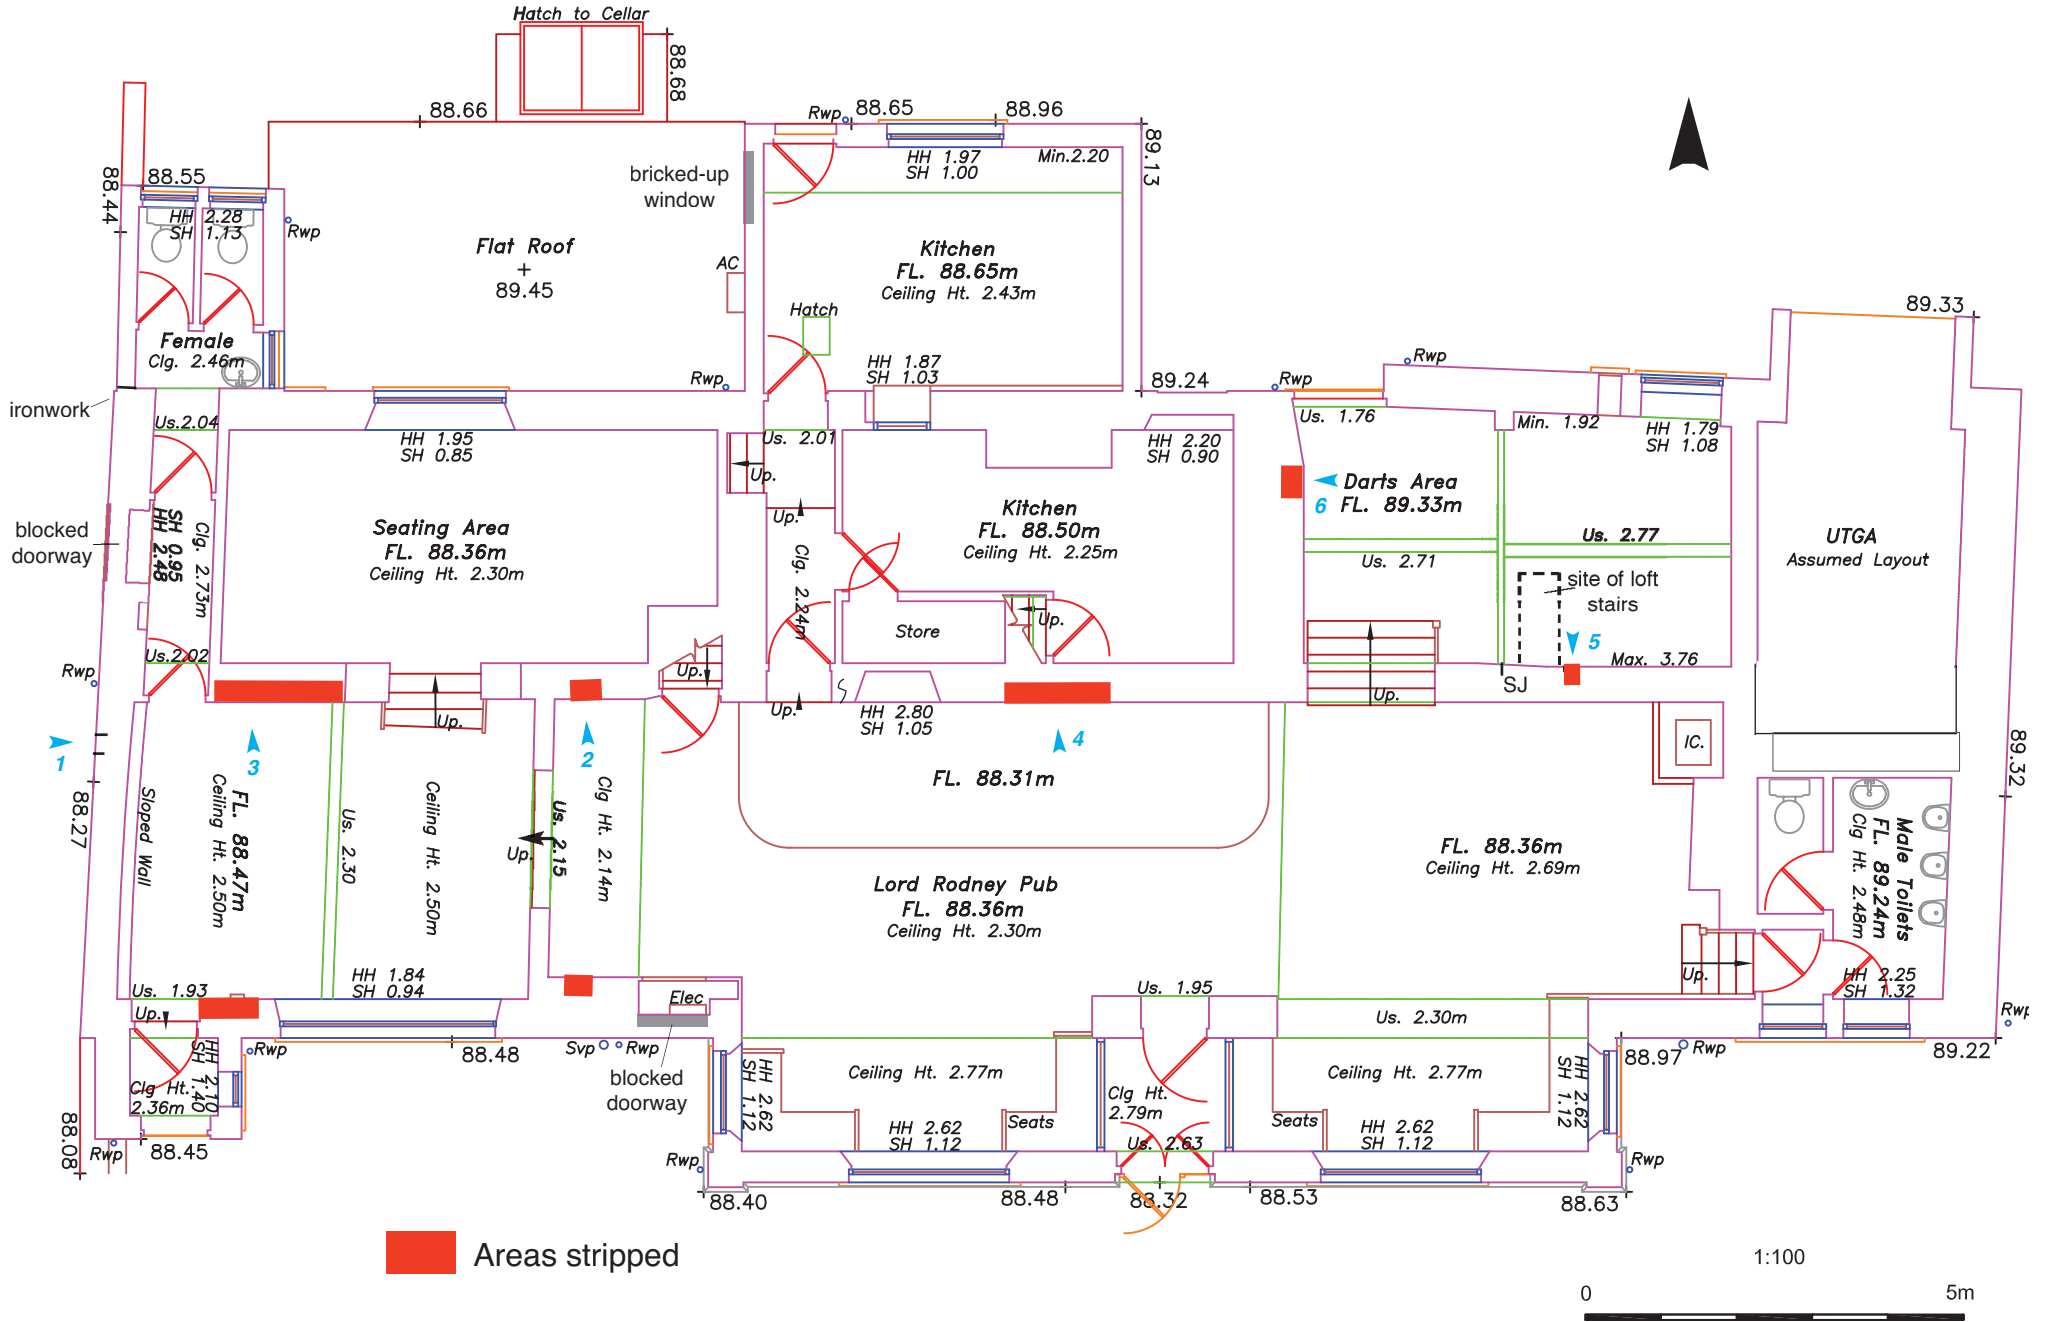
Ground floor plan with sample patches marked, scale 1:100, plate directions in blue
